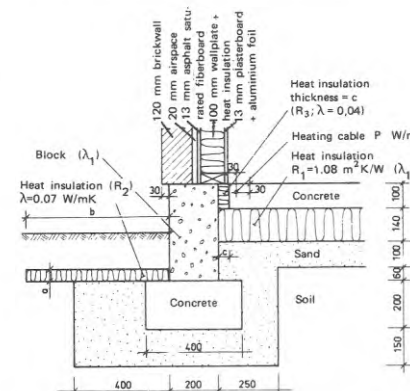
Foundation on a concrete slab combined with a foundation wall.
